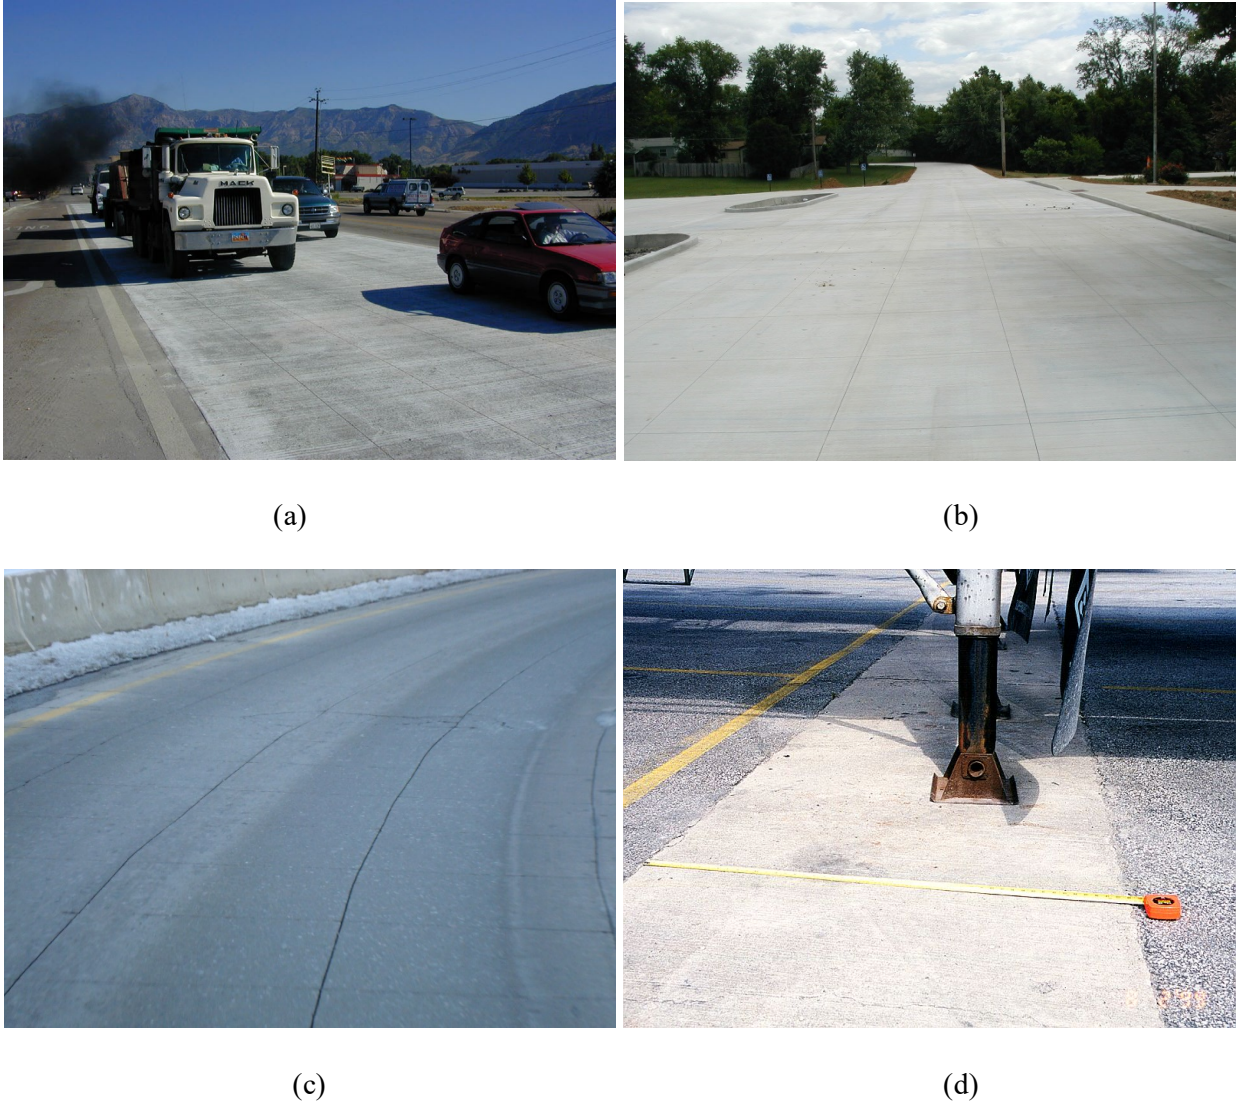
Street/Road (FRC bonded on asphalt), (b) Parking lot (FRC Unbonded on Asphalt), (c) Highway (FRC Unbonded on Concrete), (d) Industrial Pavement/Trucking Facility (FRC bonded on asphalt)
